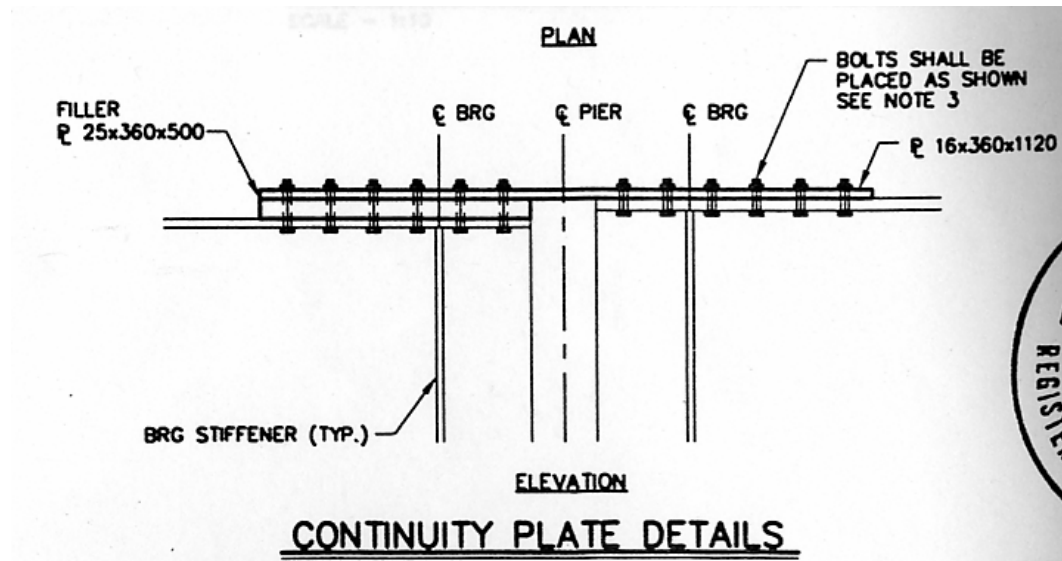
Las Cruces Bridge Continuity Plate Detail (Wade 2000)
